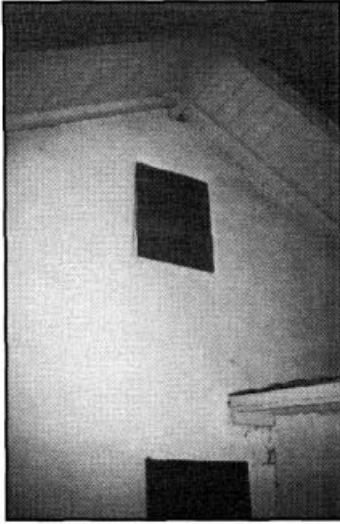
Reyes Adobe. Gable-end wall suffered minor damage during the Northridge earthquake.
